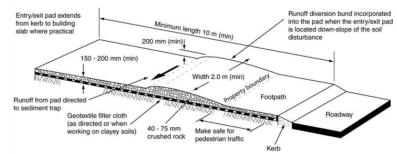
TYPICAL ALL-WEATHER SITE ACCESS STABALISED ENTRY/EXIT PAD
